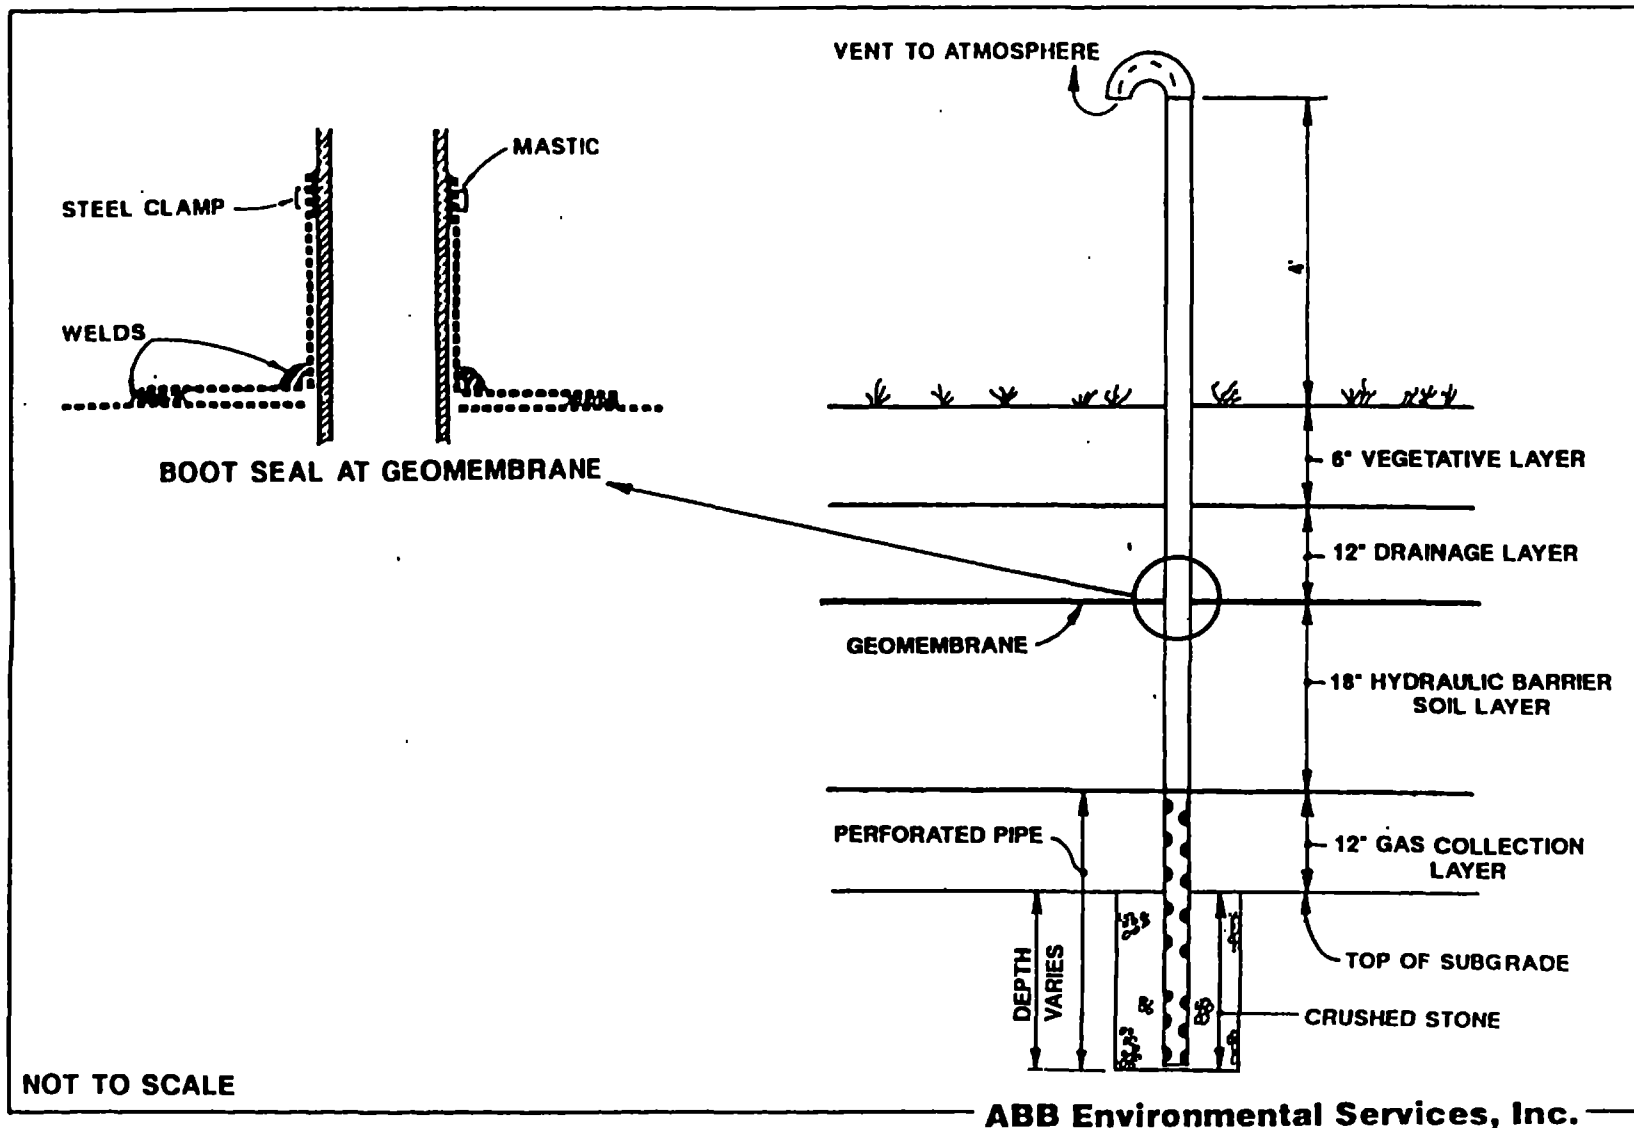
Typical Cross Section Of Gas-Venting System,
